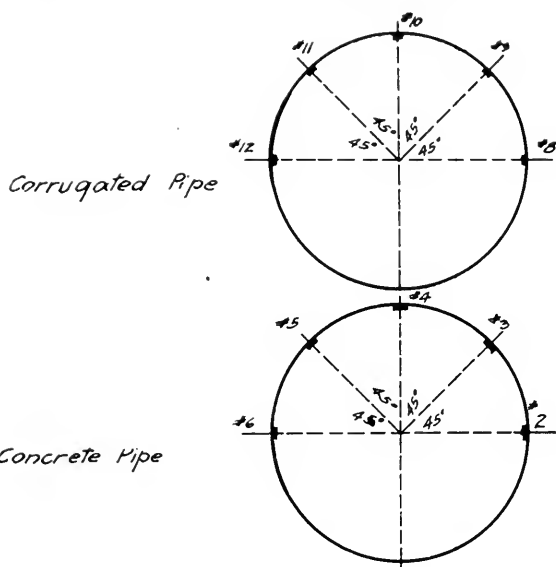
LAYOUT OF TEST CULVERT AND LOCATION OF CELLS. PRELIMINARY TEST NO. 2.
